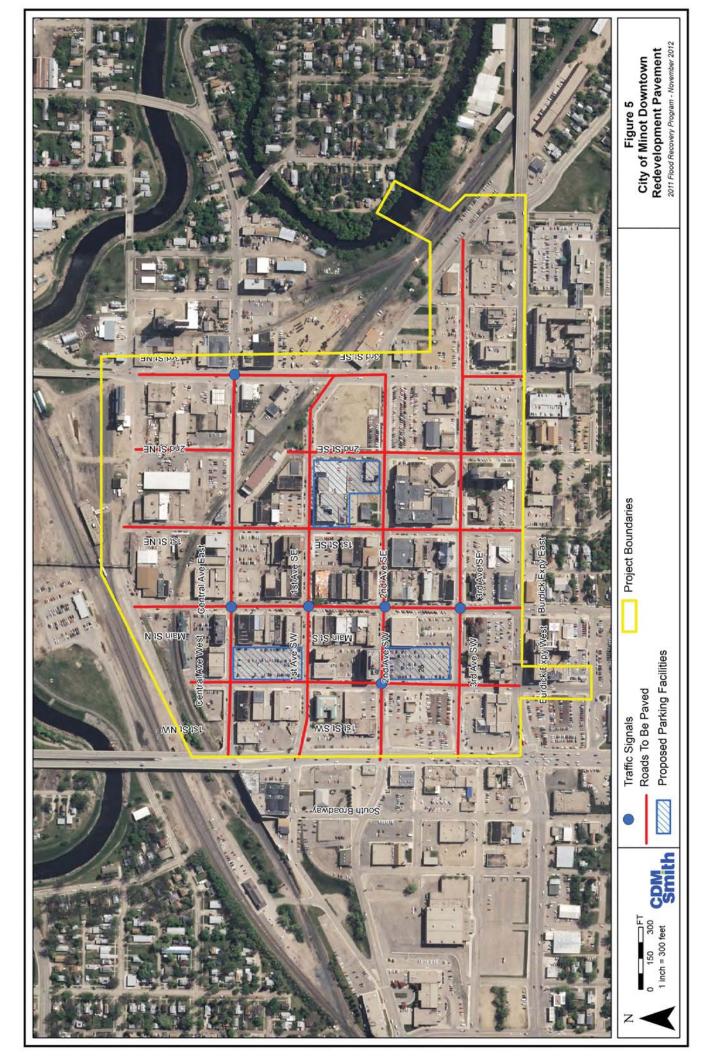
shows the streets that are recommended for repaving. Appendix E contains a detailed summary of the improvements. All of the streets within the study area are recommended to be replaced due to poor existing condition, or the need to replace the existing City utilities. Existing curb and gutter and sidewalks are severely damaged and uneven, which causes safety concerns.
